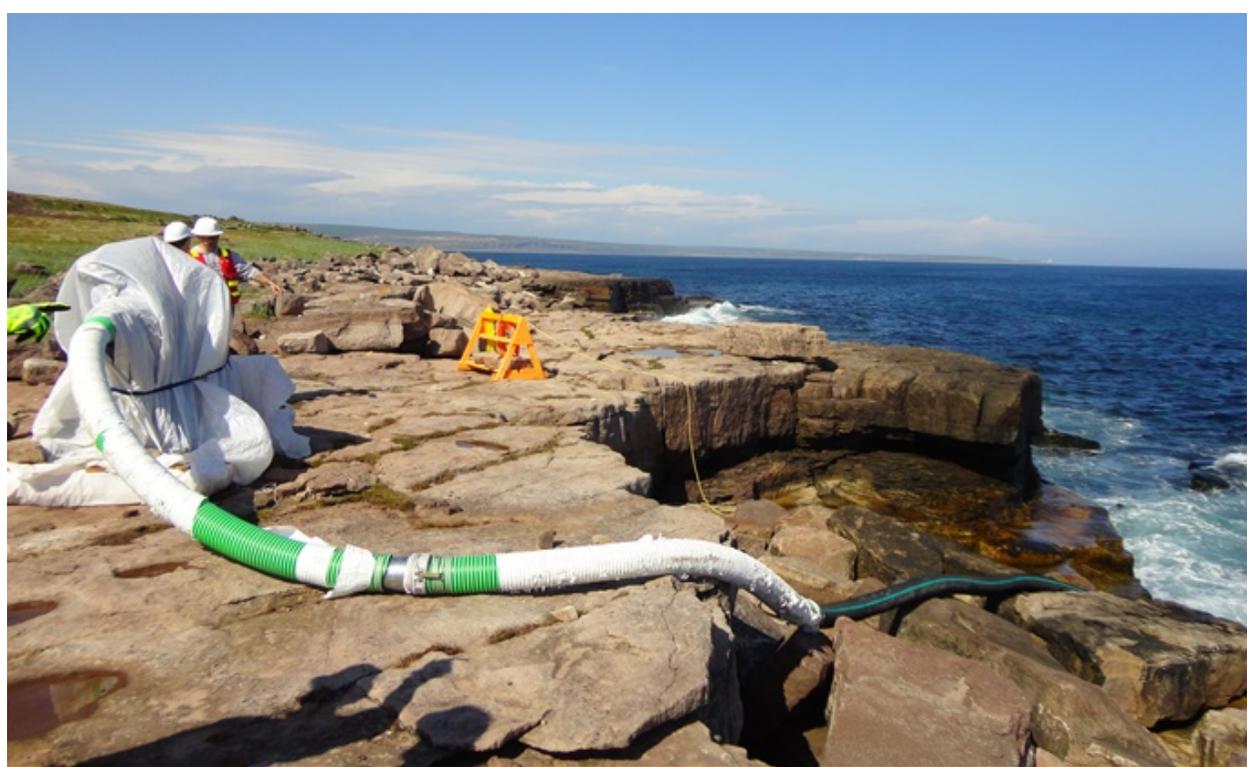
Forteau Directional Drilling. Subhorizontal bedded sandstone at the Forteau drilling site.
